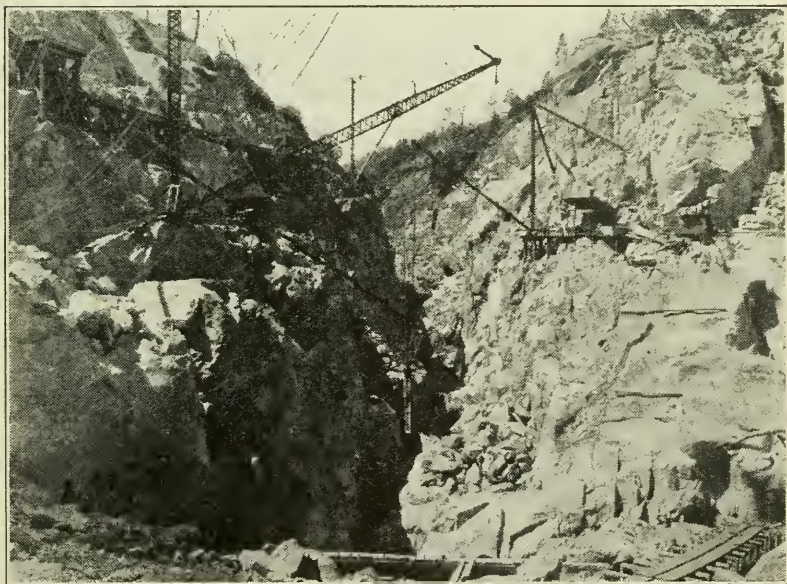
HETCH HETCHY DAM VIEW LOOKING DOWN STREAM. EXCAVATION PRACTICALLY COMPLETED.
